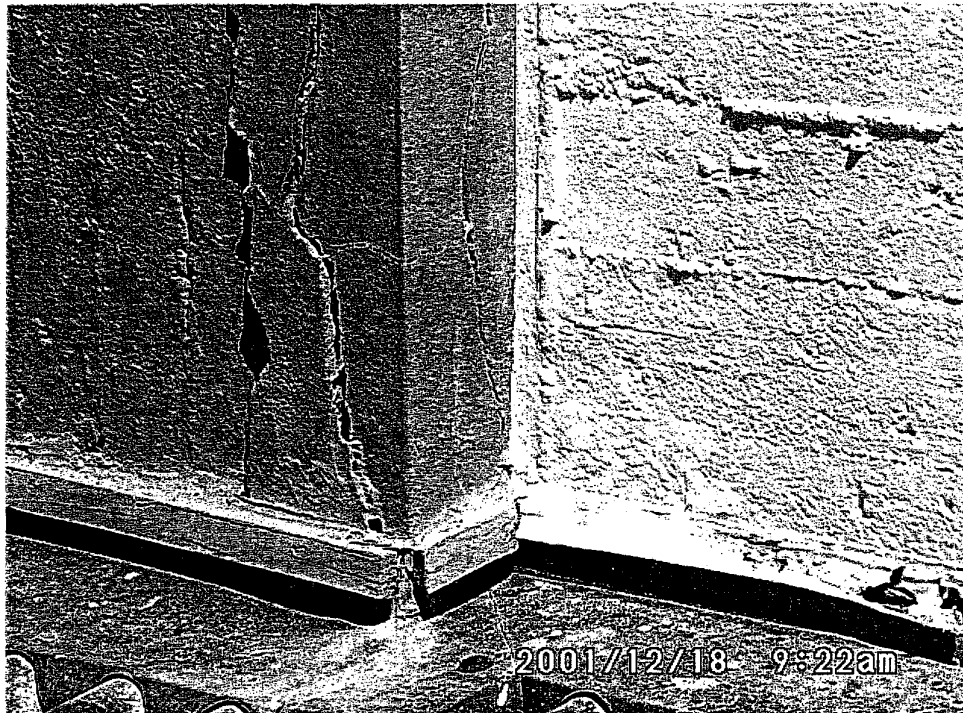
Drumminess exposed to reveal severe corrosion of rebars.
